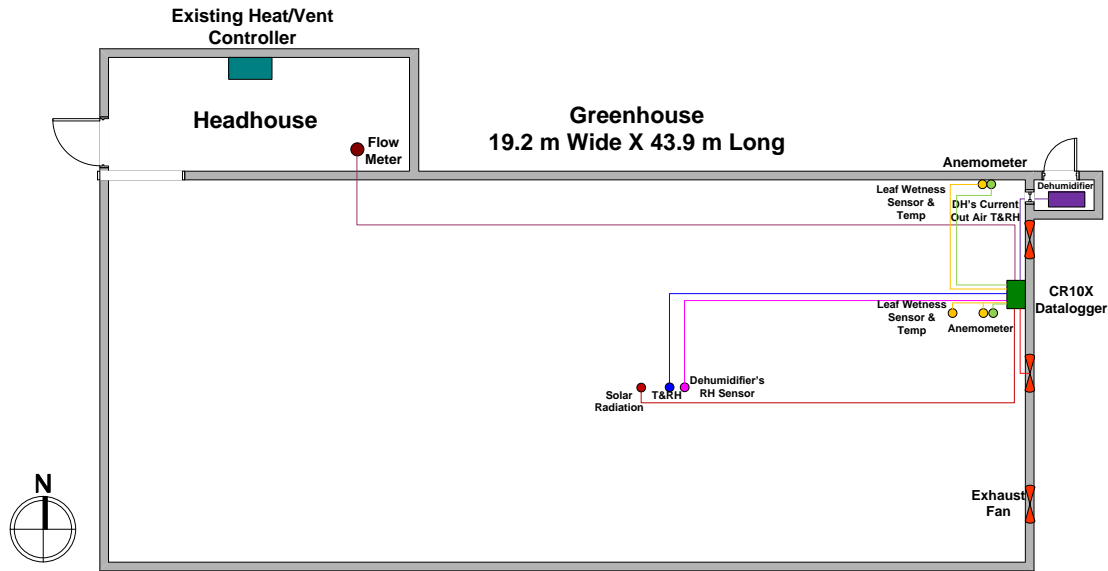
Sketch of the greenhouse layout and measurement position (unit: m).
